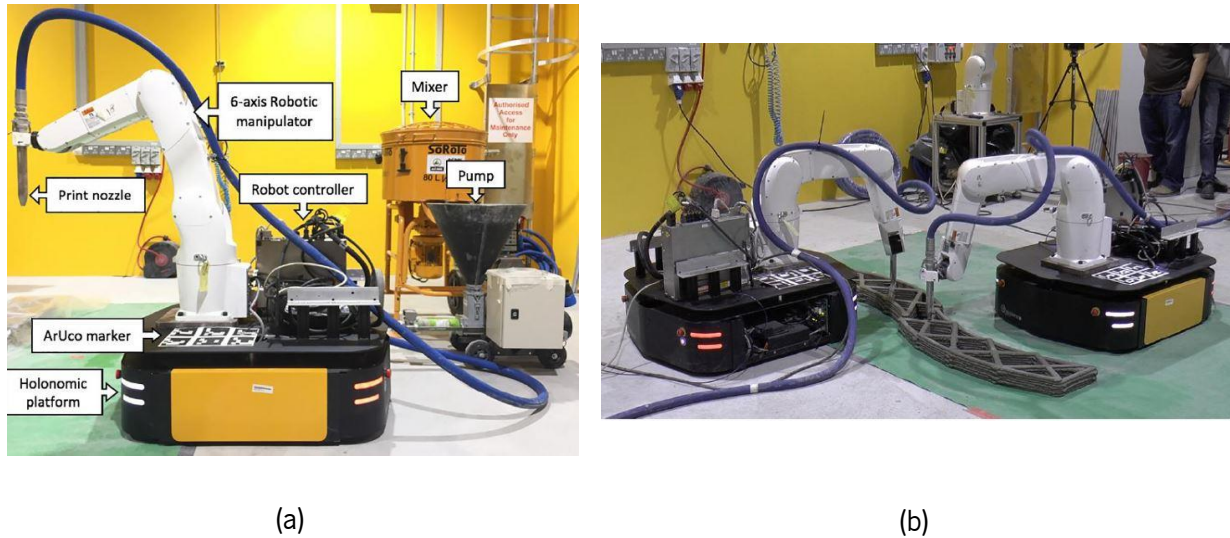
Wet-extrusion technology using mobile robots. (a) System setup for one robot printer and (b) Concurrent printing of a large, single-piece, concrete structure by two mobile robot printers (X. Zhang et al., 2018).
